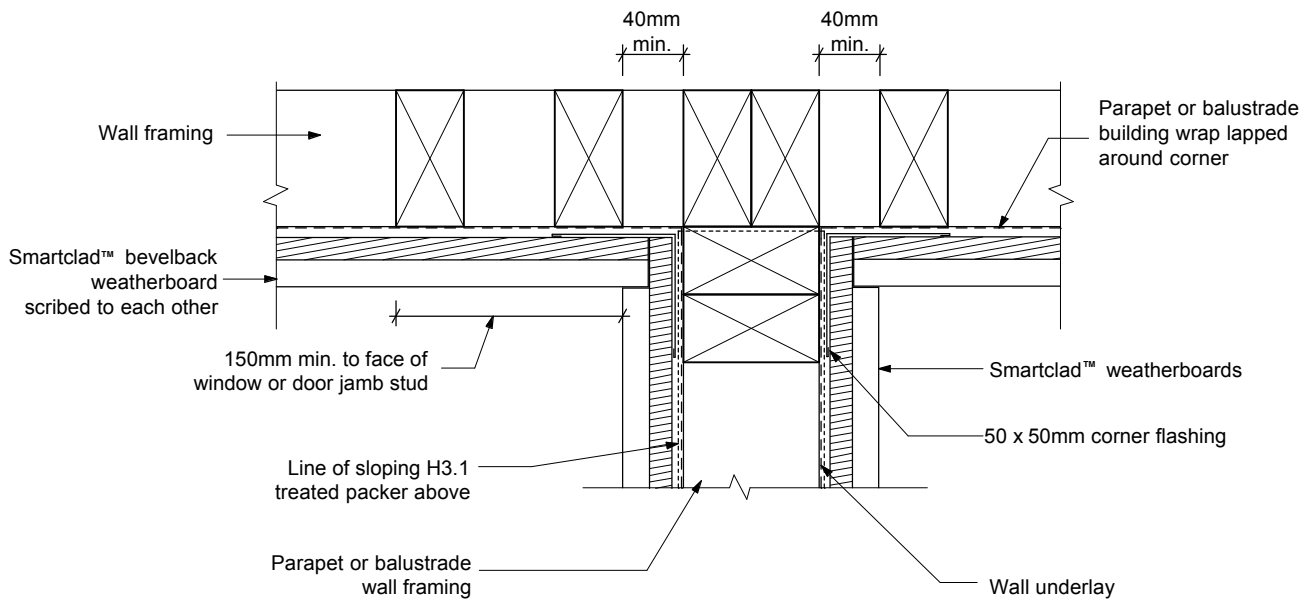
Direct fixed - Parapet/Balustrade - Wall junction - Plan View
